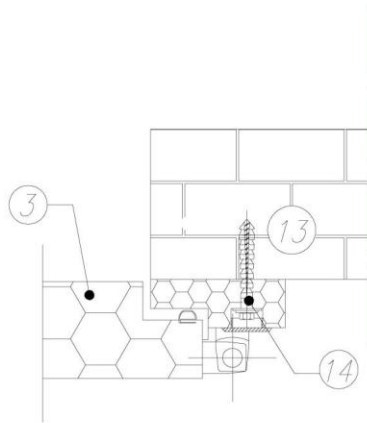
/2 INSTALLATION OF FREEZER DOORS TO A WALL
